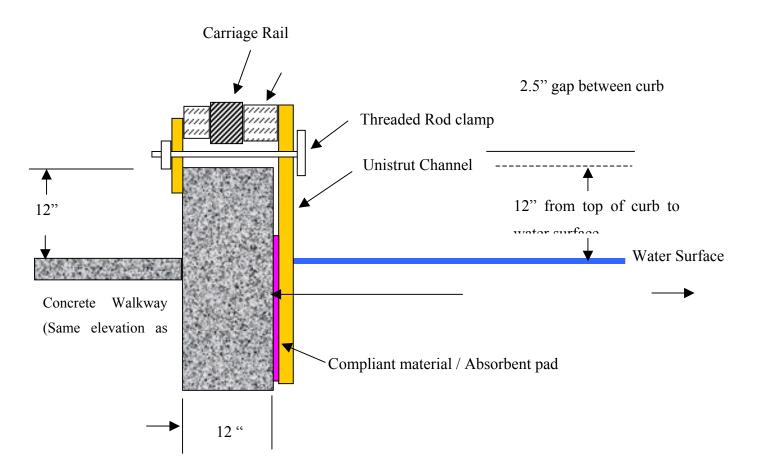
System to Attach Boom to Side of CRREL Test Basin
